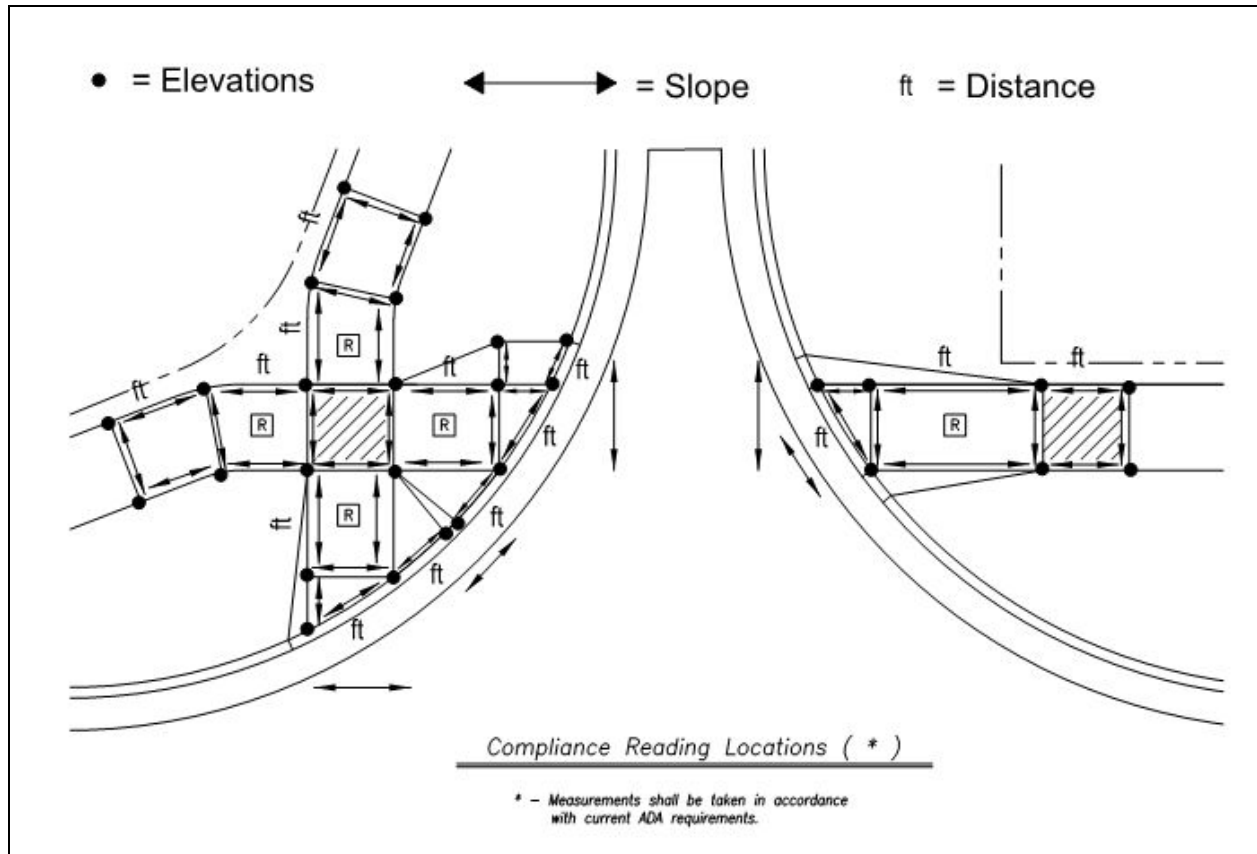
Compliance Reading Locations for Sidewalk Ramps and Pedestrian Street Crossings in the Public Street Right of Way.
